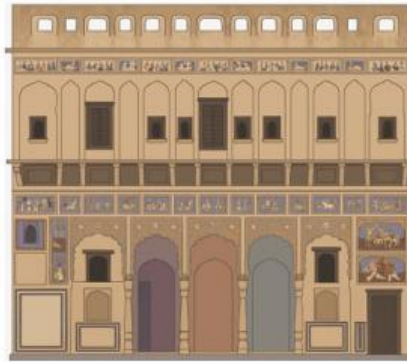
Elevation of a traditional Haveli in Mandawa, Shekhawati, Rajasthan.
